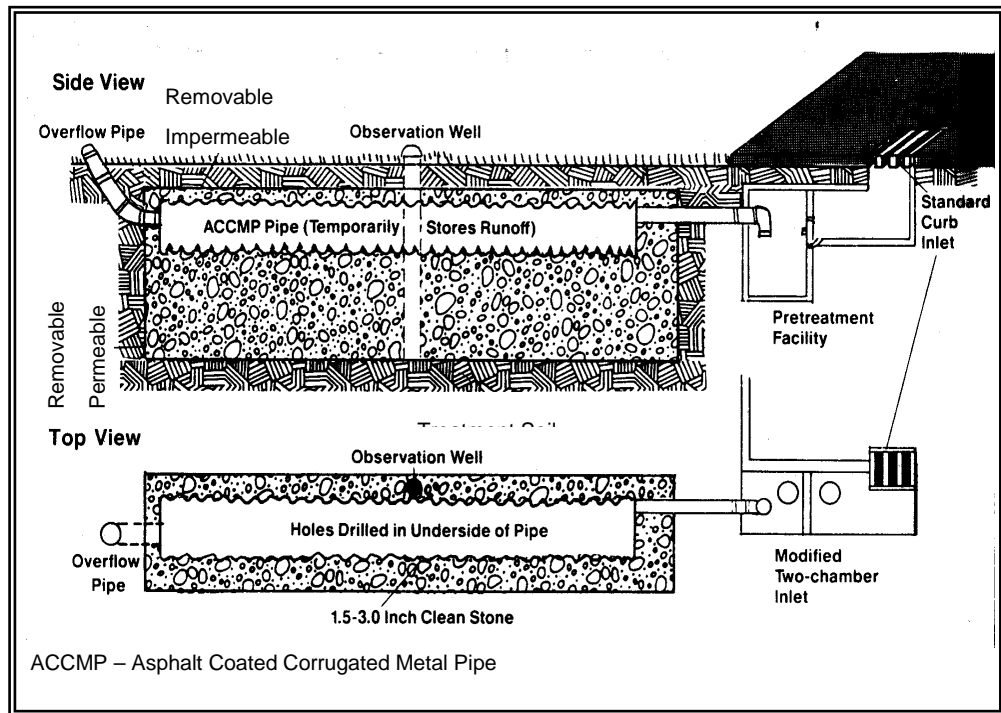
Parking Lot Perimeter Trench Design
